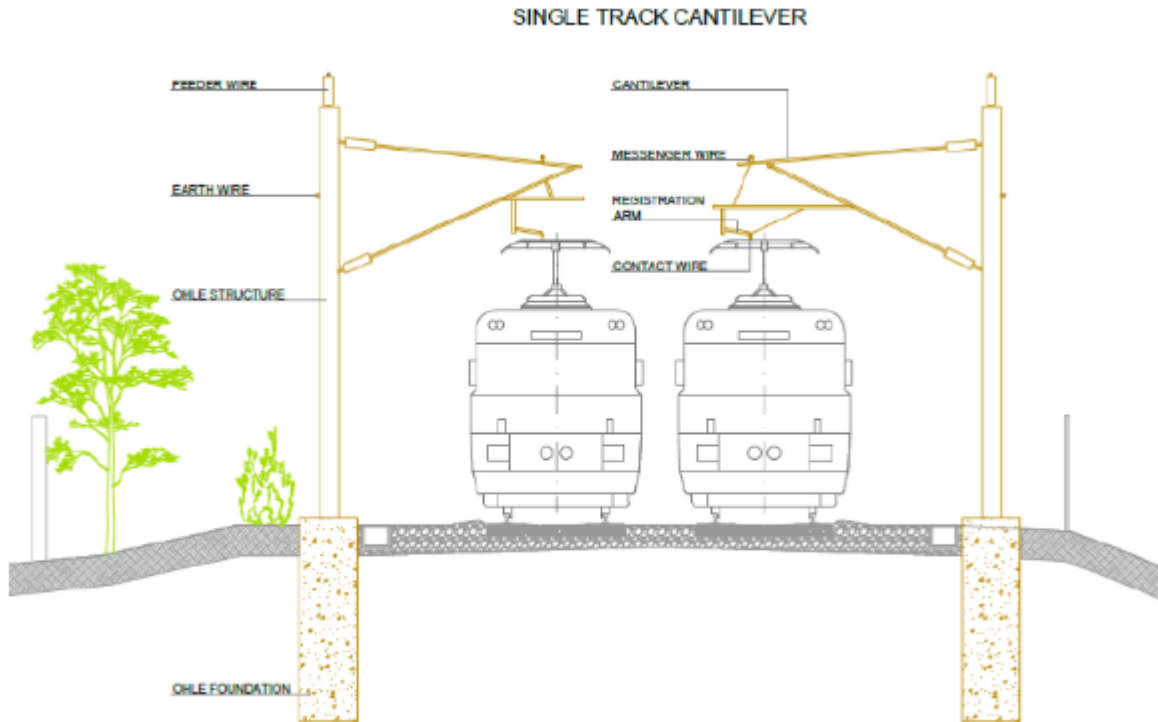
Single Track Cantilevers (STC) in 2-Track Section
